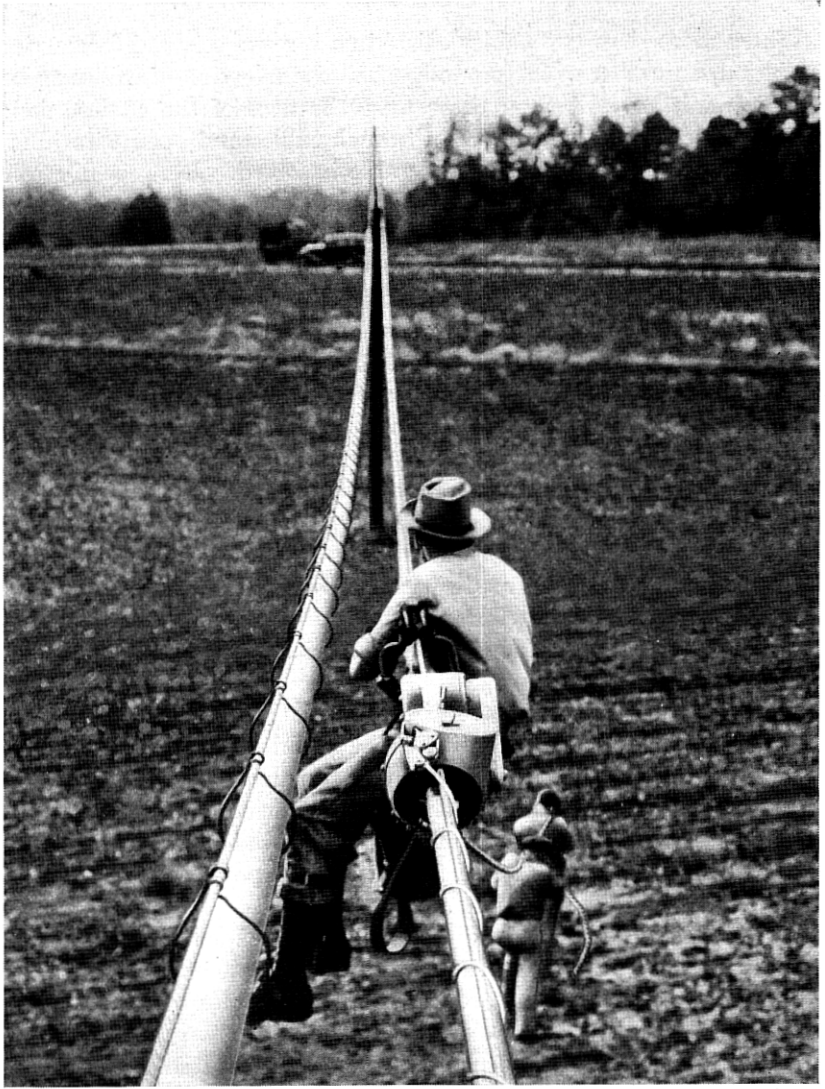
Method of lashing cable to messenger with galvanized steel wire shown in progress.
